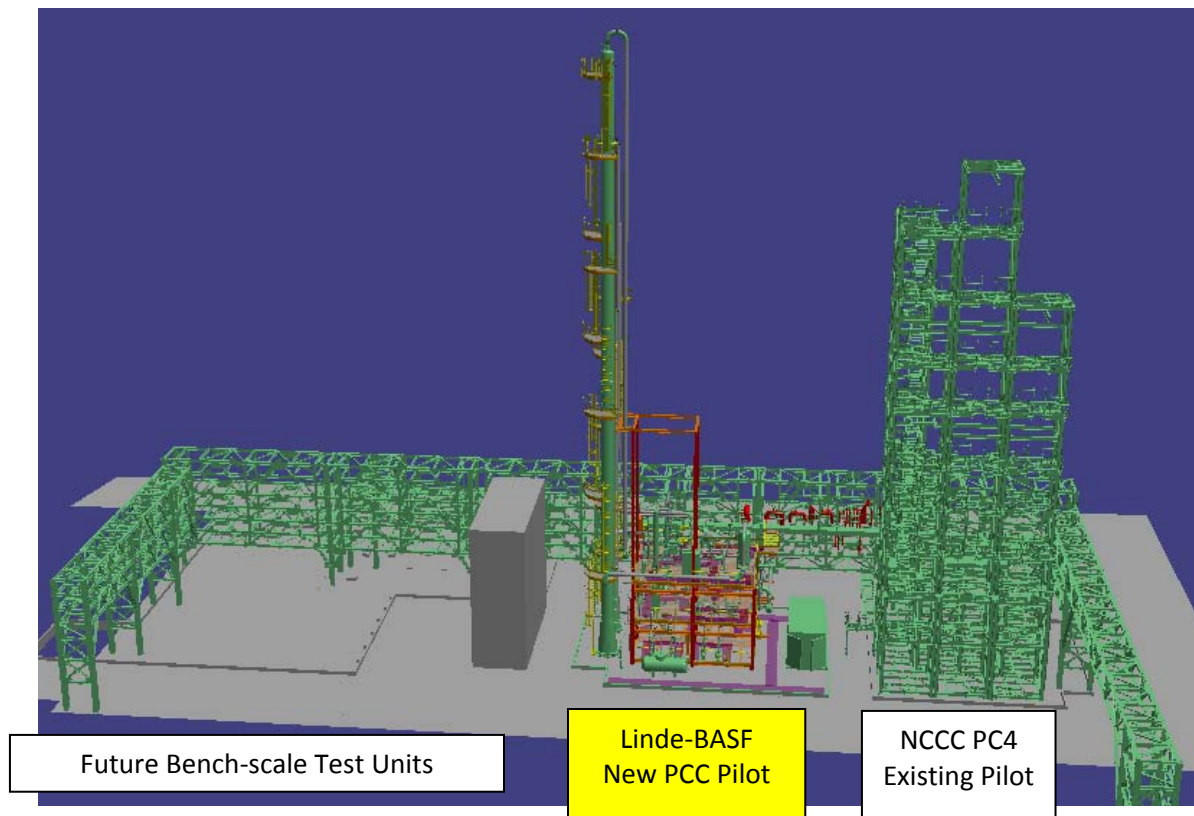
3D Model of Linde-BASF Pilot Plant Installed at NCCC in Wilsonville, AL
